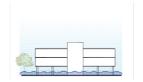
G: 4th Street Corridor Parking Ratios & Unit Size (Narrow Frontage Half Block)
